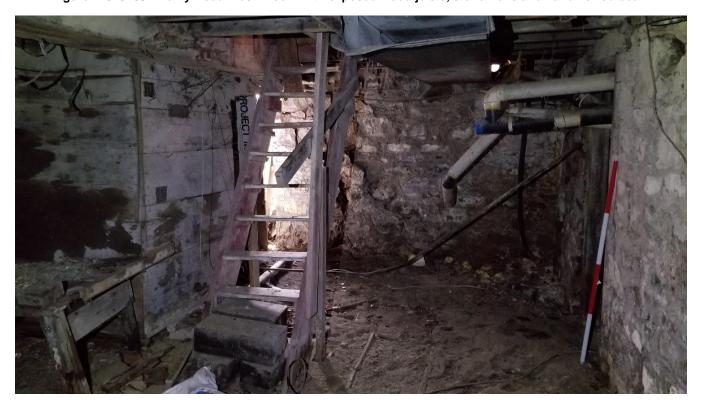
9285 Twenty Road West: Wood stairs and room providing access to the large room to the west as well as the exterior
